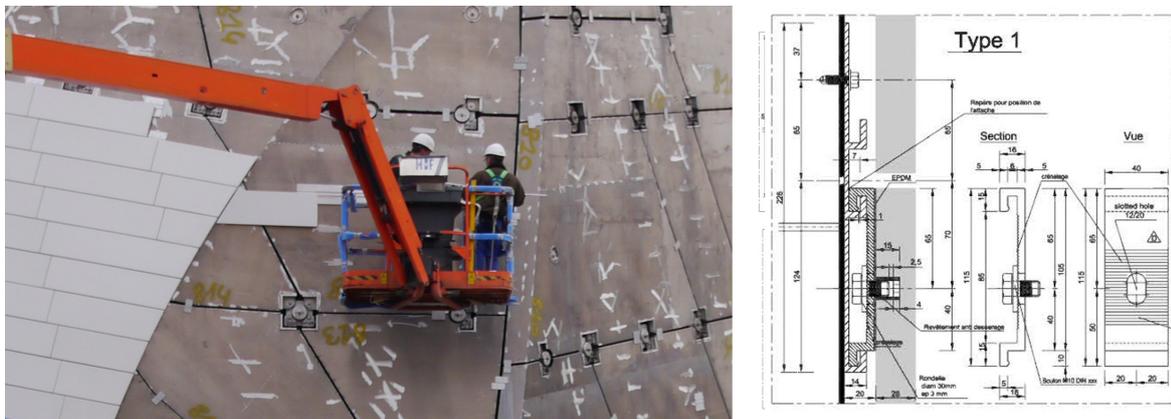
Erection and fixing system by HRE (Hofmeister Roof Engineering).
